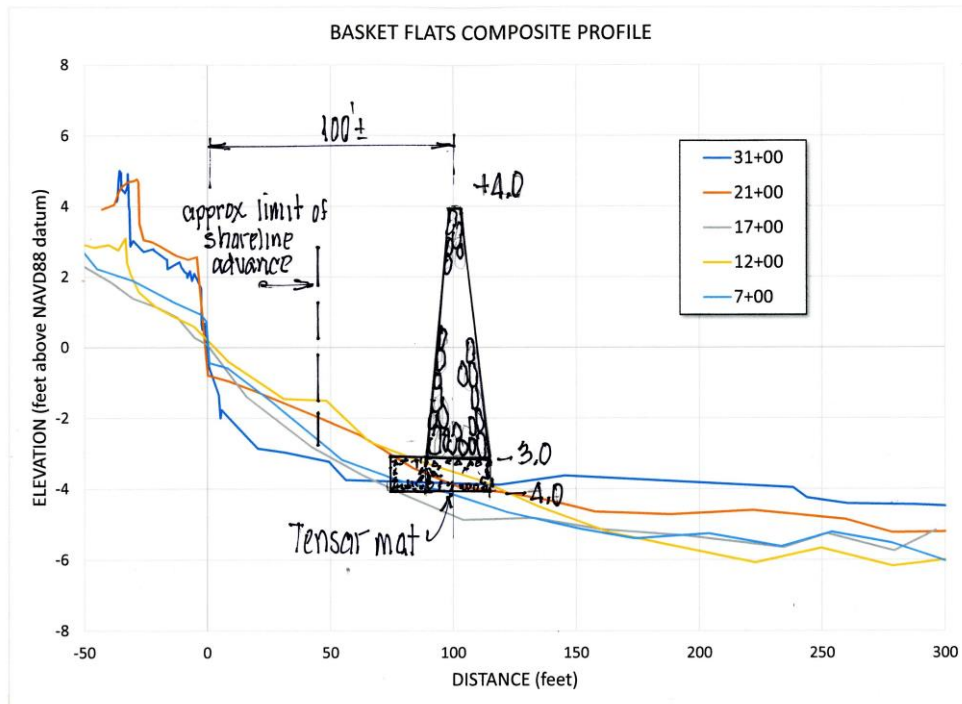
Breakwater Cross-Section Shown on Basket Flats Profiles.
